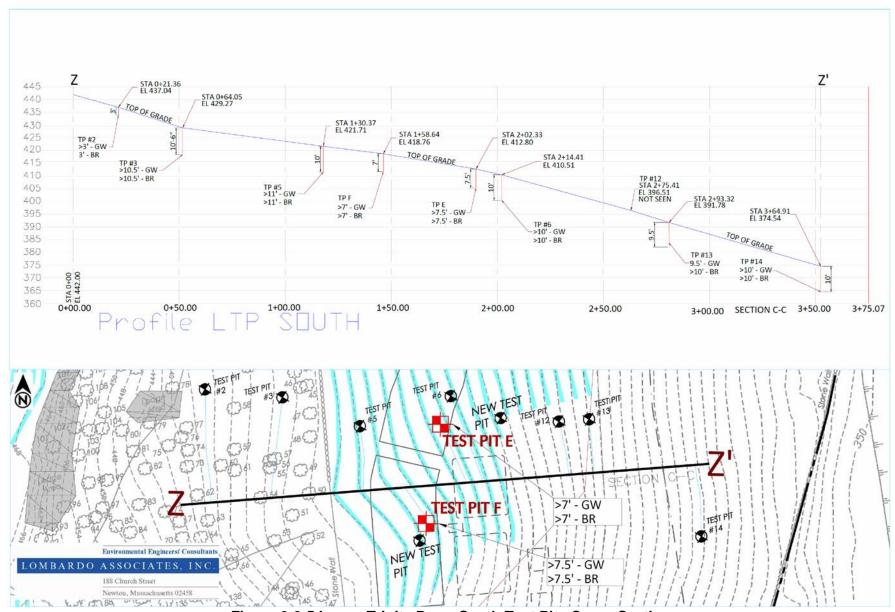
Lower Trinity Pass, South Test Pits Cross-Section
